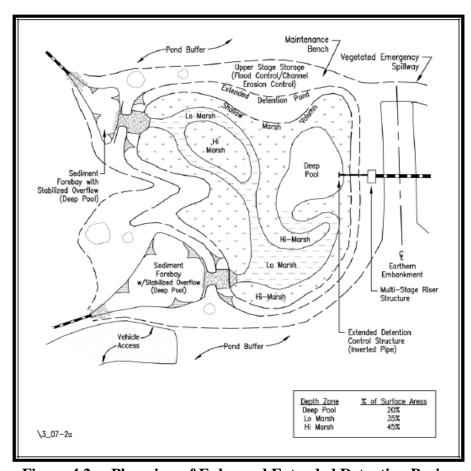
Plan view of Enhanced Extended Detention Basin Source: Virginia Stormwater Management Handbook
